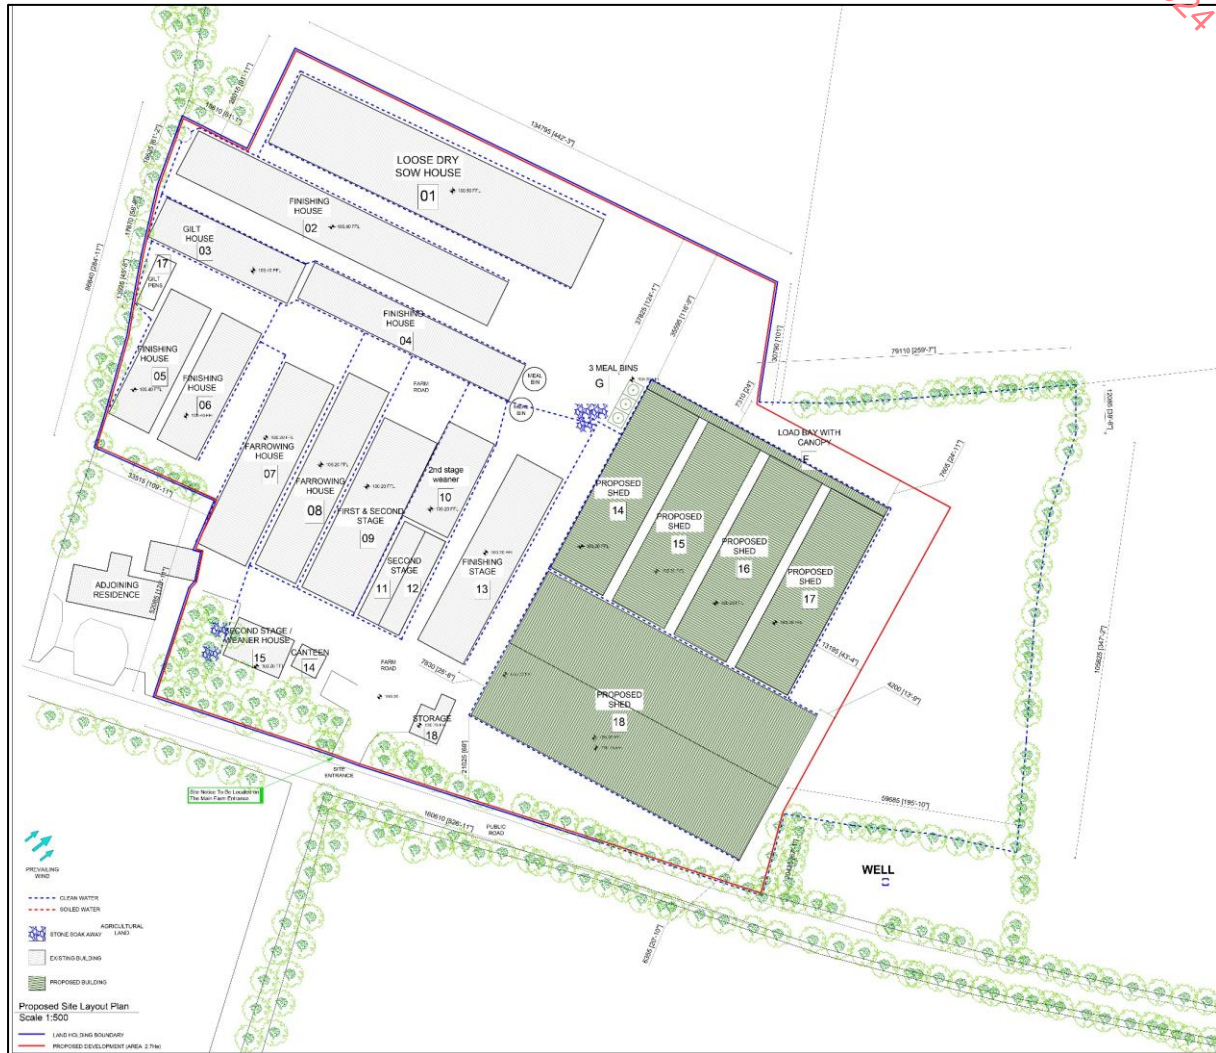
Proposed Site Layout (Agri Planning & Design)
